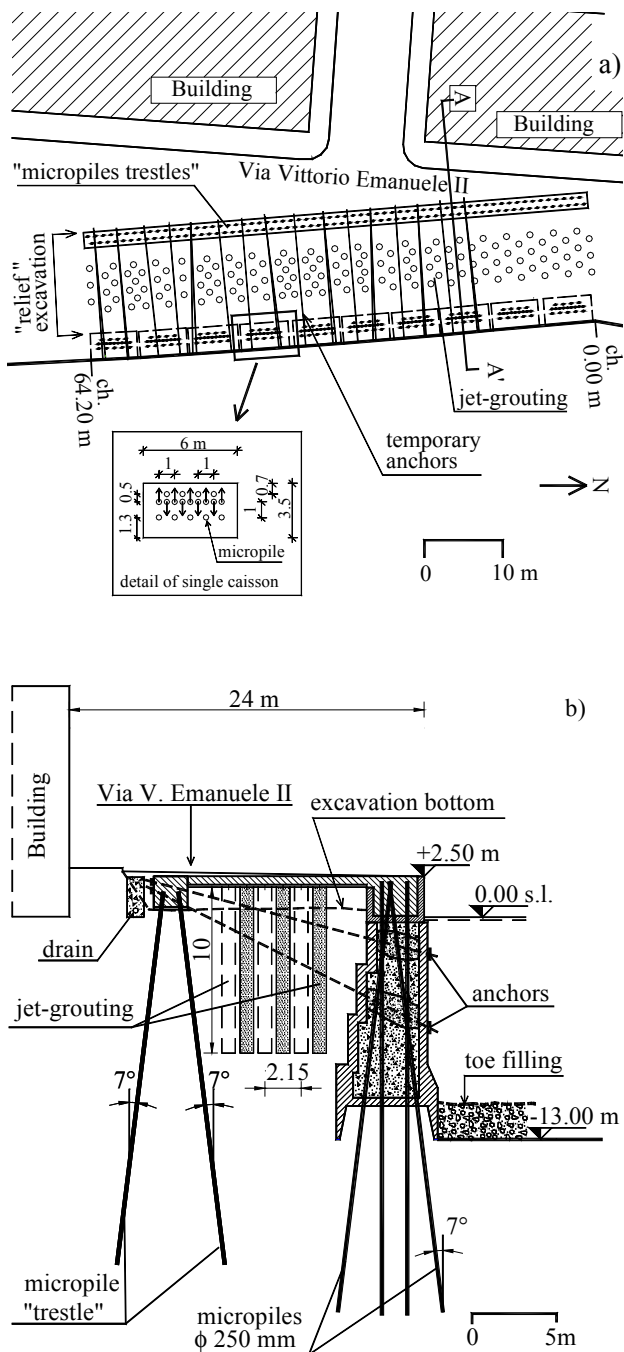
Stabilisation measures. a) Planimetric layout; b) Vertical cross section A-A'.
